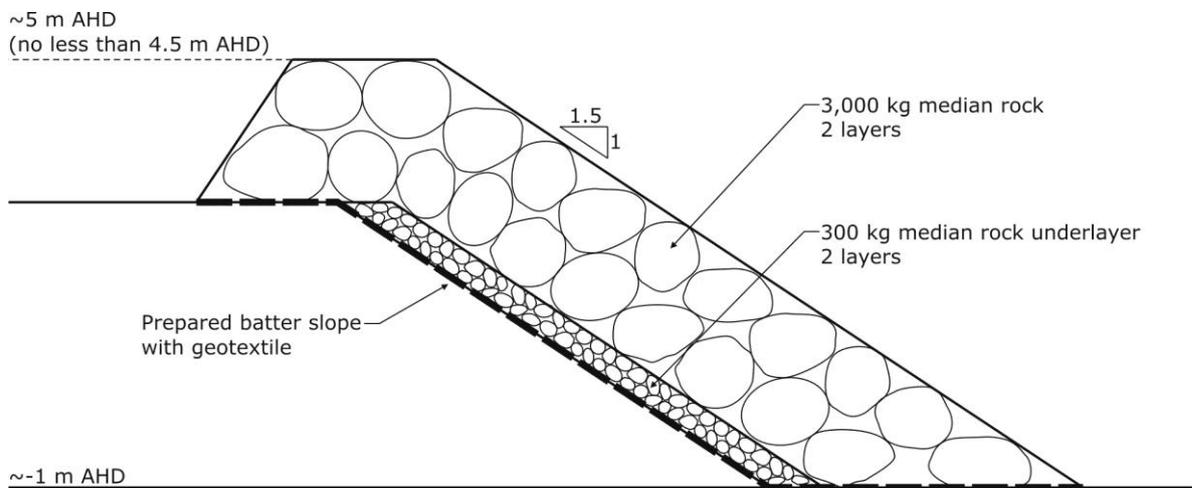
Conceptual Emergency Protection Terminal Revetment Cross-Section
